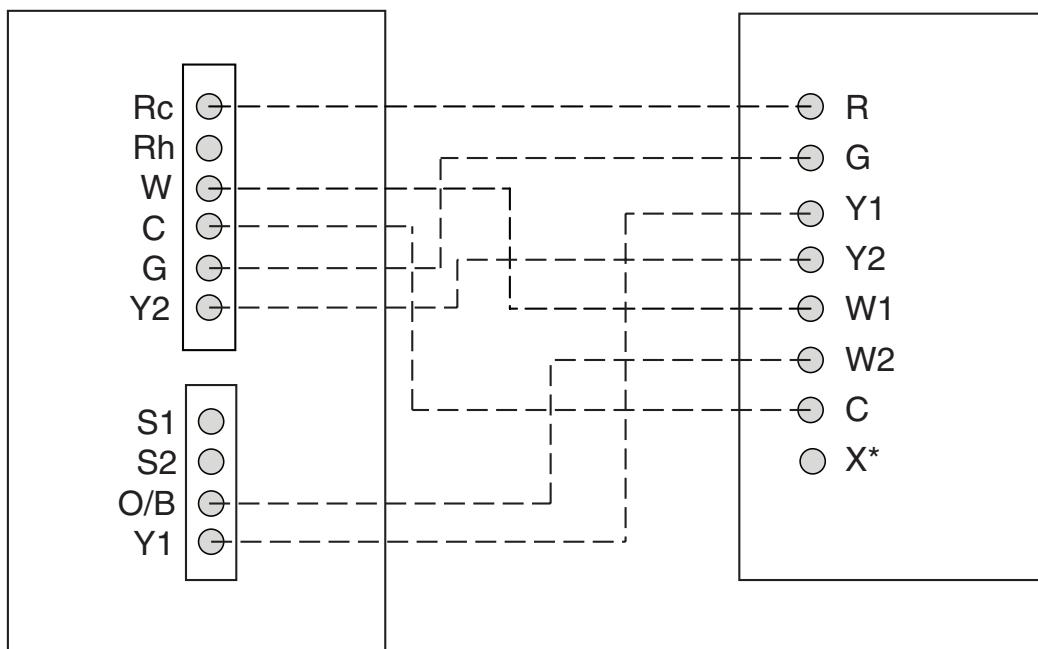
Thermostat Wiring — 50EJQ,EWQ024,028 Heat Pump Units
